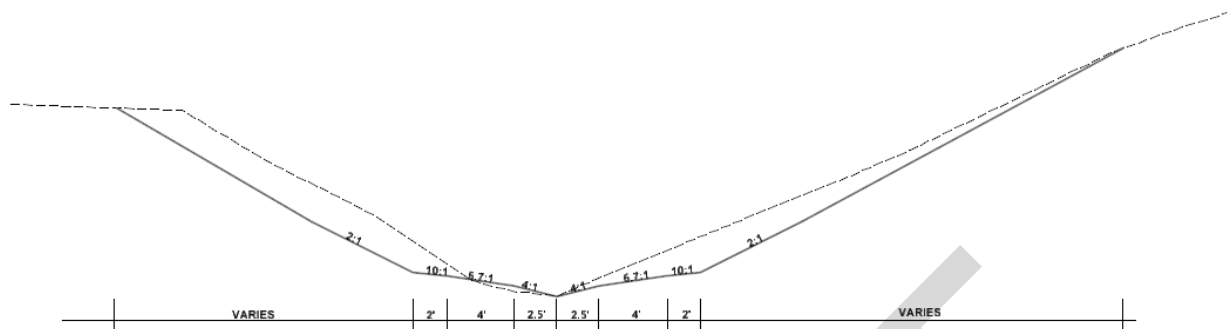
Typical Stream Cross section vs Proposed Cross Section
